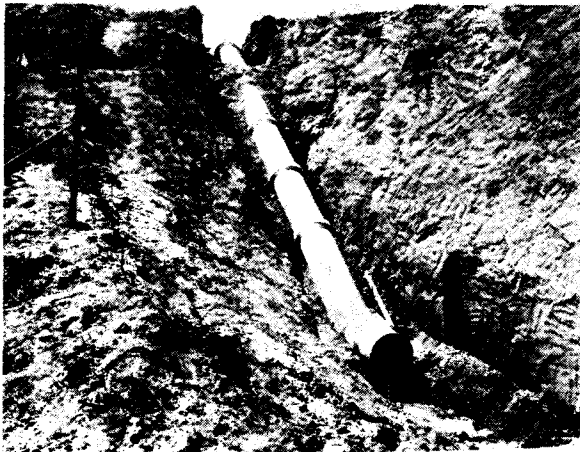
Precast reinforced concrete pressure pipe in trench prior to backfilling. P-271-701-3819
